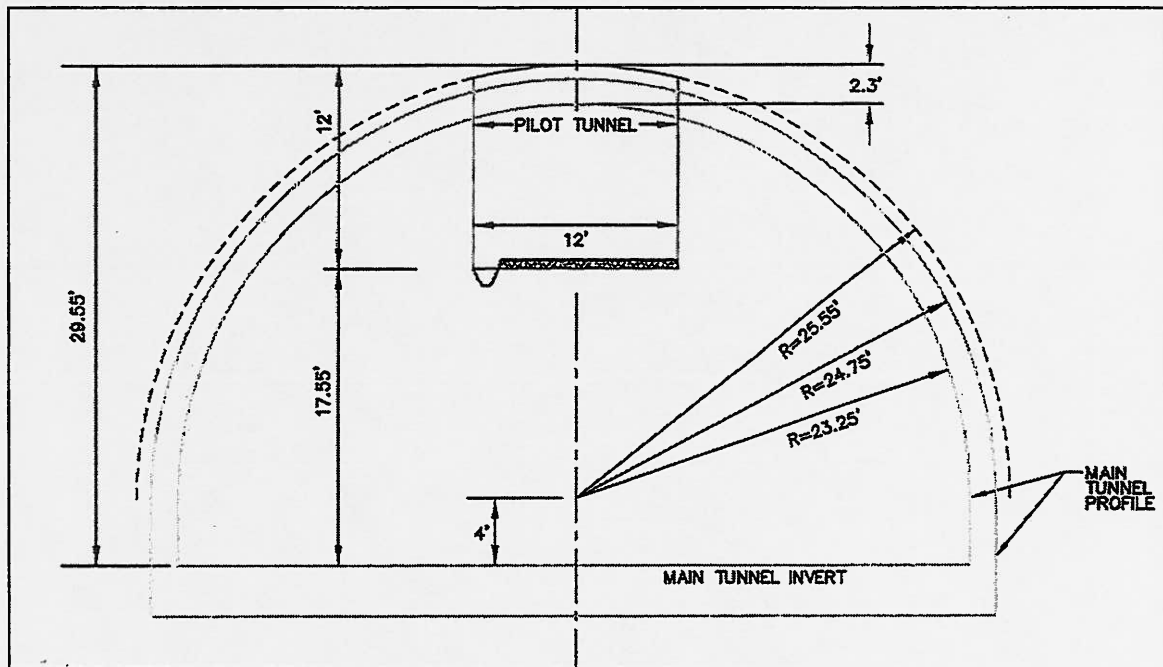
Proposed Main Tunnel Layout and Pilot Tunnel
